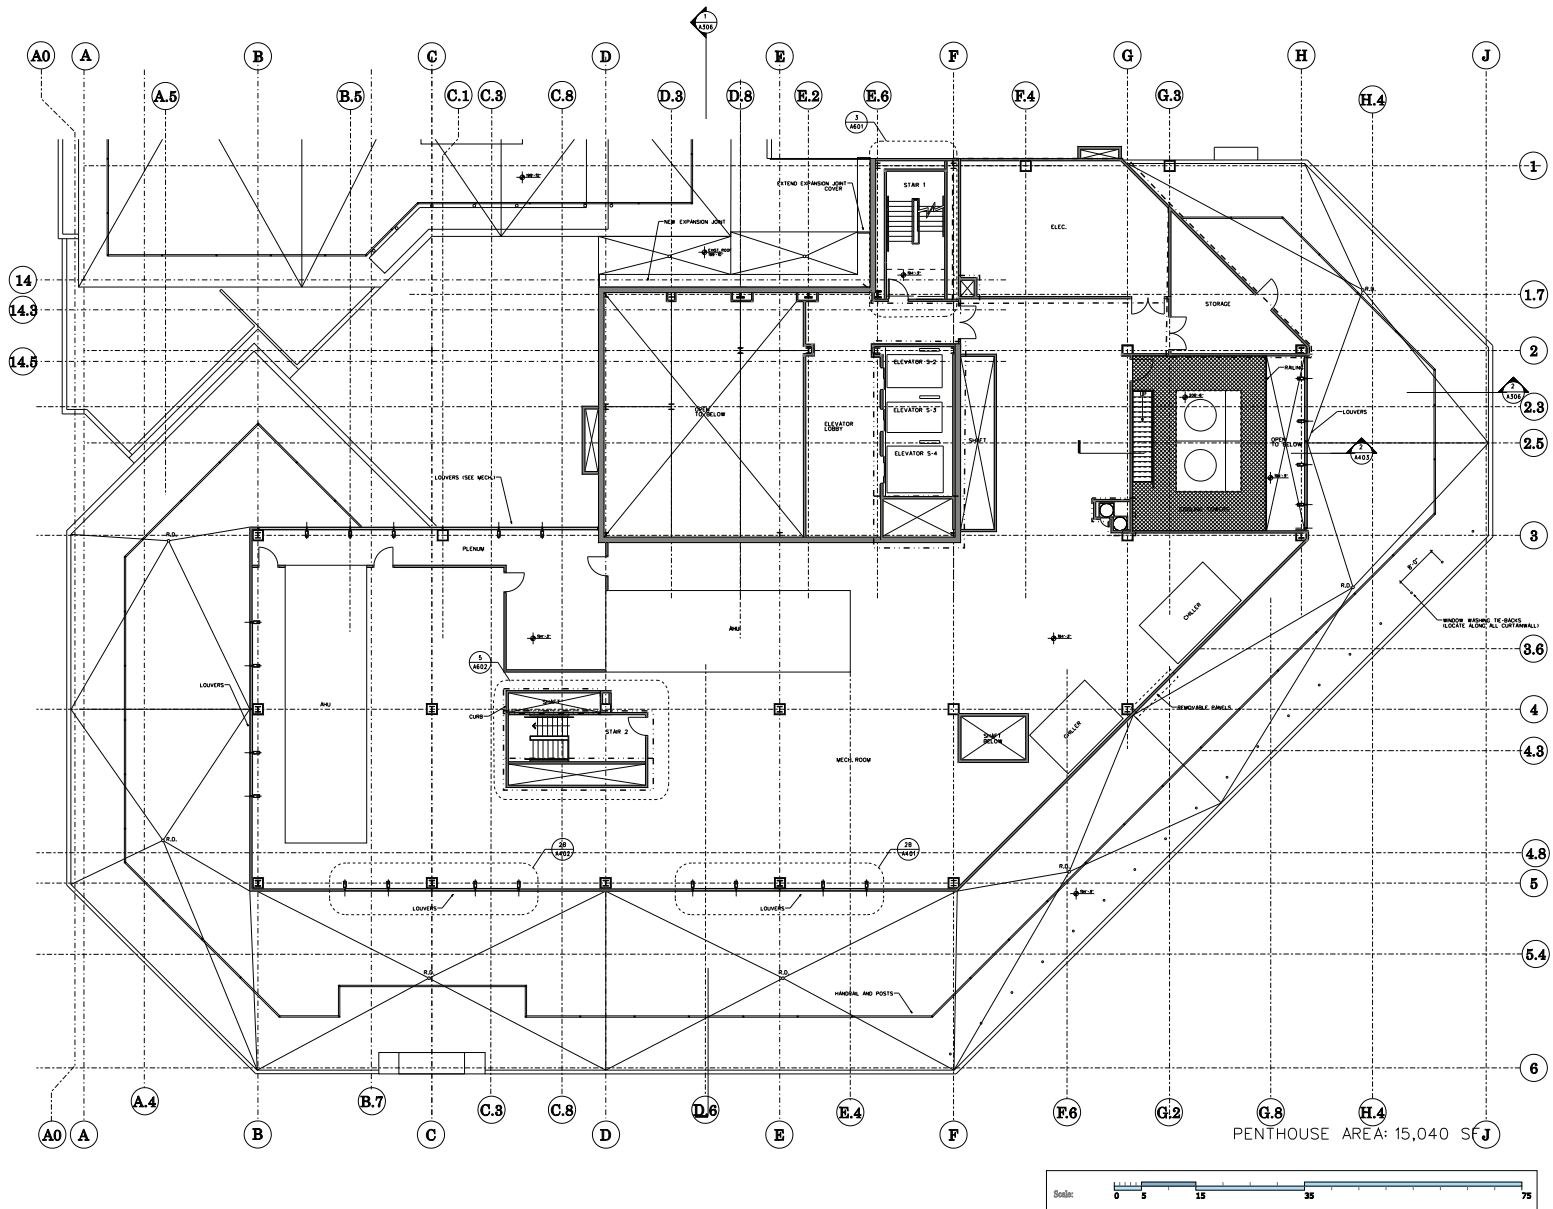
INPATIENT EXPANSION - FLOOR 12 PLAN
